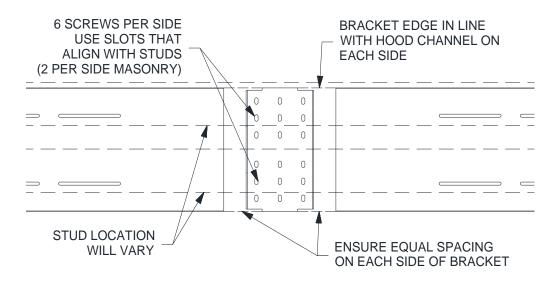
Front Shaft Support attachment to Upper Shaft Support
